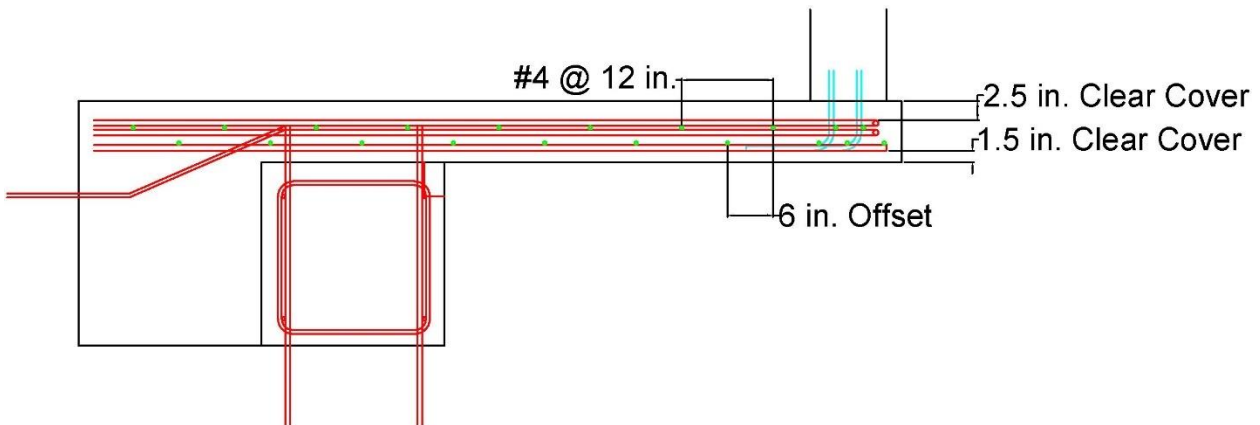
Option 2, Bridge Deck Overhang Cross Section
